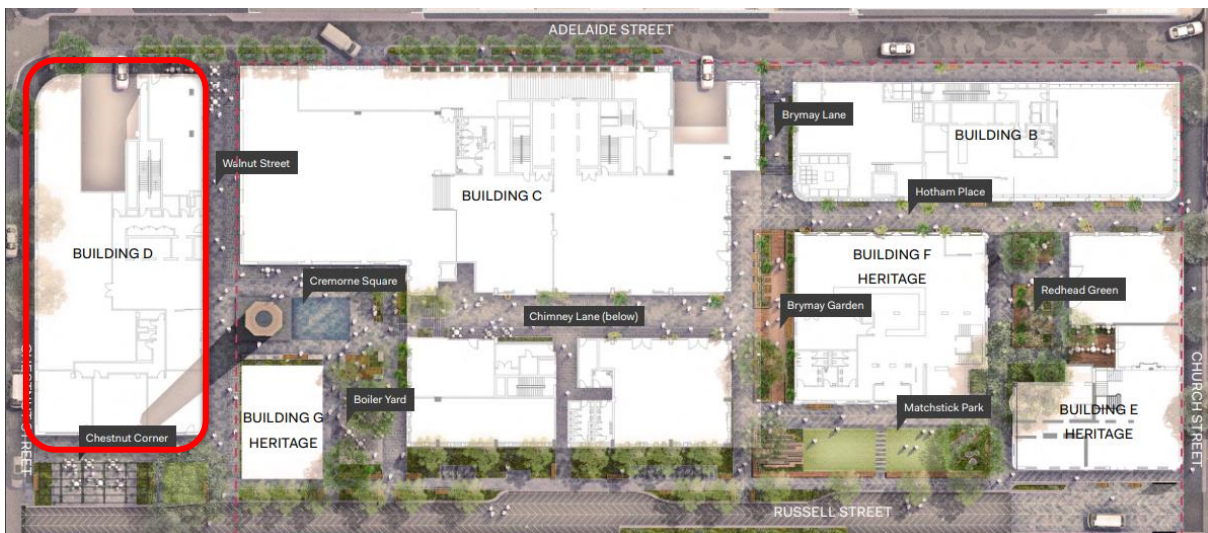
Extract from Masterplan showing landscape zones, including a range of proposed courtyard/plaza spaces, and new streetscapes. Source: Officers Report, p. 21.
